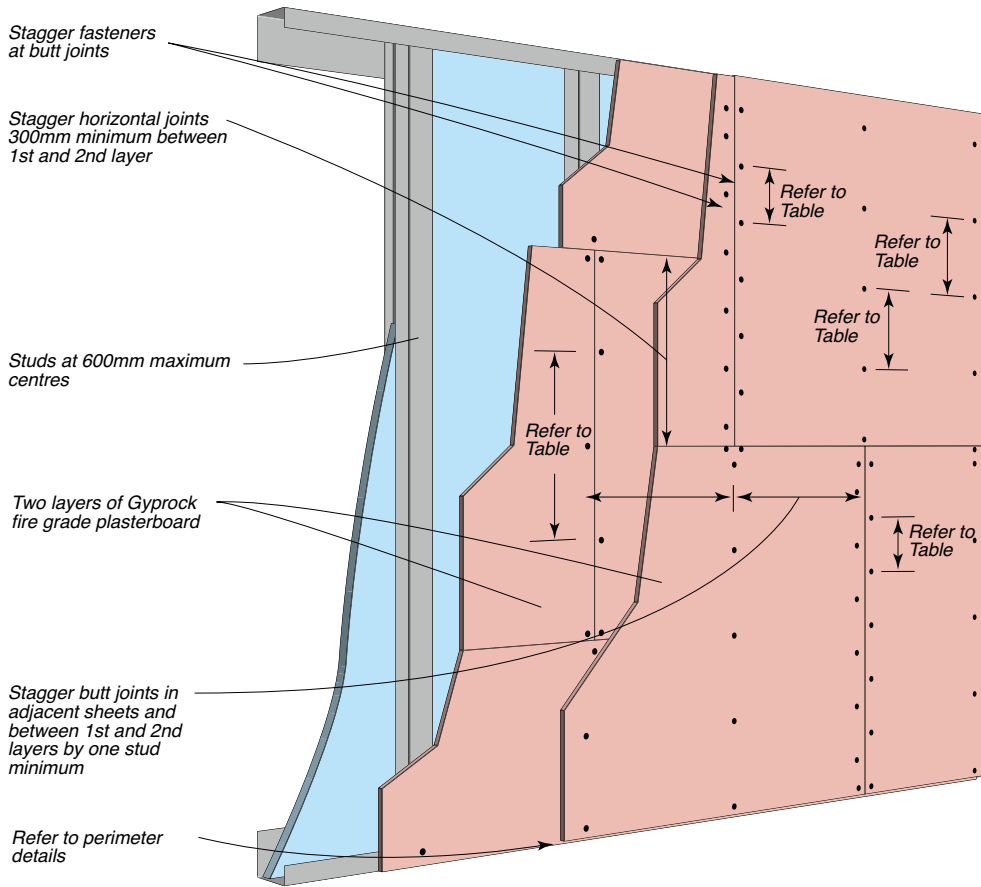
Fire Grade Plasterboard Fixing to Shaftwall – Two Layer Vertical Sheeting – Non-Tiled Areas
